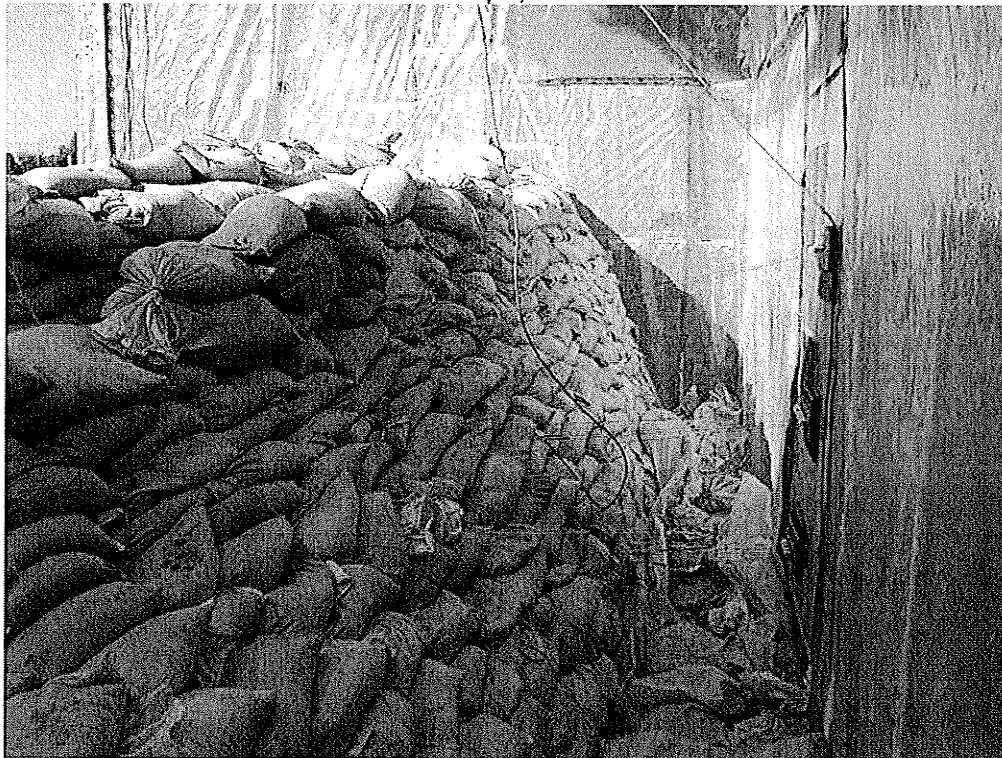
Dike C3 Final Deformed Shape, View to the West inside Flume.
